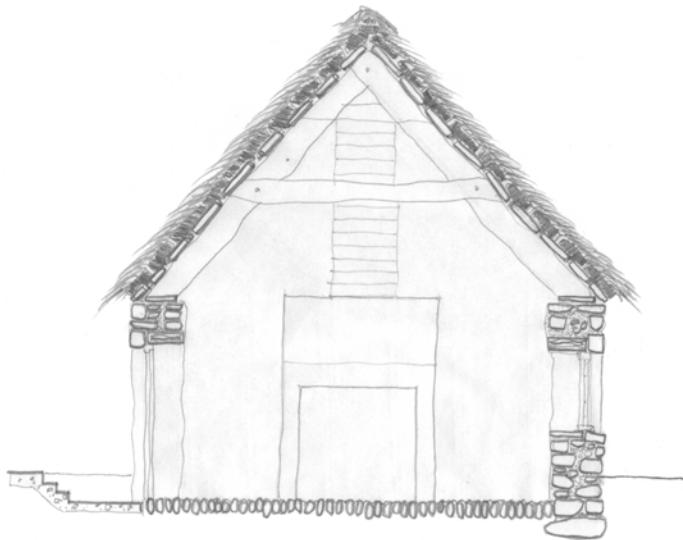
Cross section through former smiddy looking north-east. The section shows the straw and clay thatch roof on turf sods supported by variable-thickness sarking battens on A-frame trusses. The trusses sit on stone and lime walling and the floor is cobbled. Note that the floor is below ground level and that the steps down to the rear access door are constructed in concrete. The large concrete and brick forge/fireplace is shown on the north-east gable.
